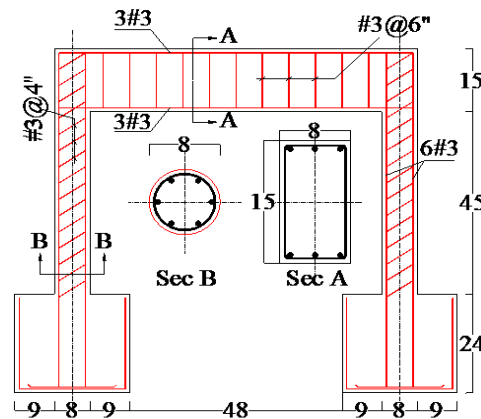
Concrete dimensions and reinforcement of the monolithic frame.
